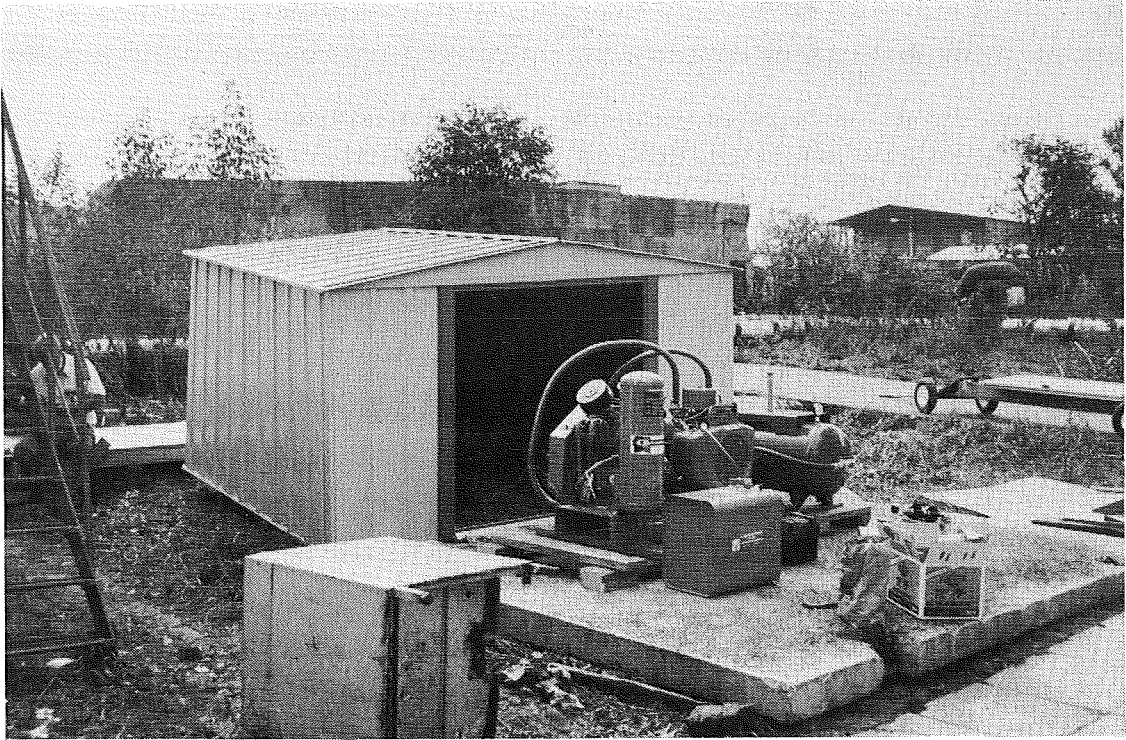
COMPRESSOR IN PLACE ON SLAB
